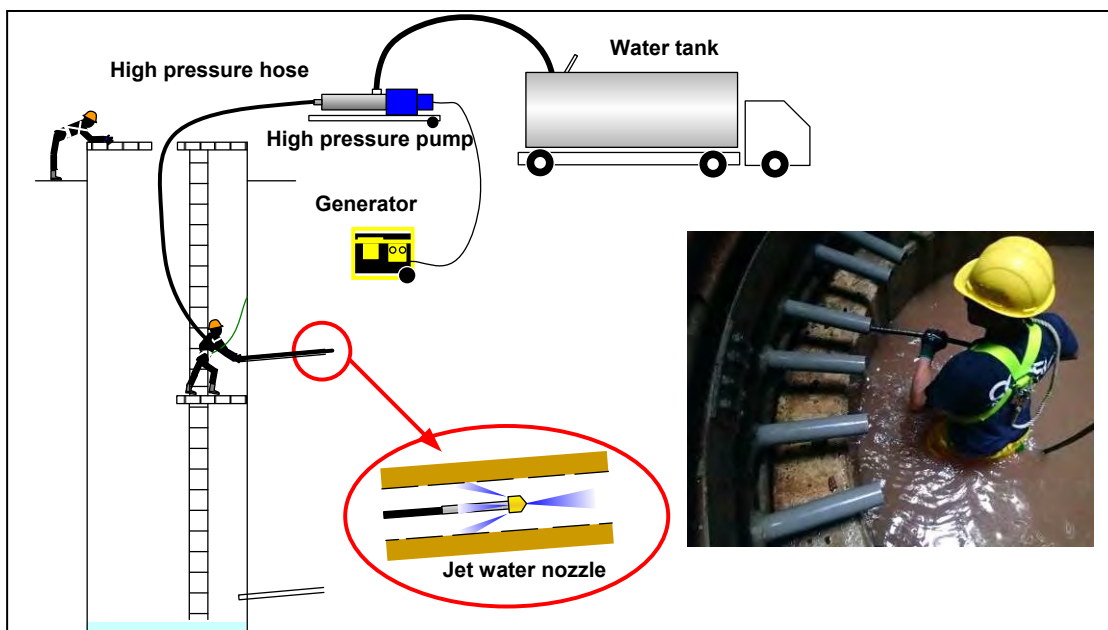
System (materials/machinery) for cleaning drainage pipes in a drainage well (Source: JET)
